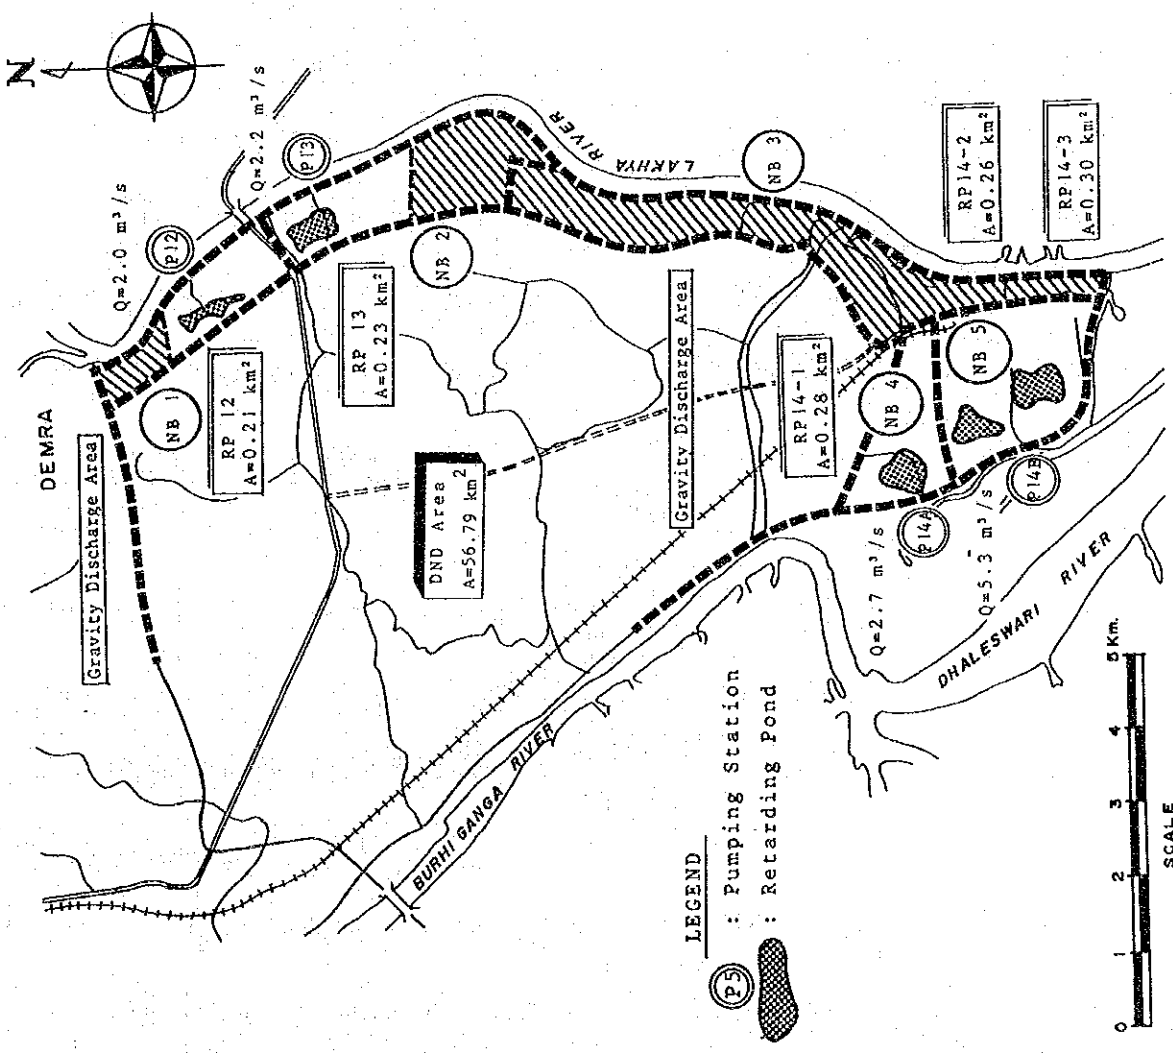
PROPOSED REQUIREMENTS OF PUMP STATION AND RETARDING POND : NARAYANGANJ WEST
